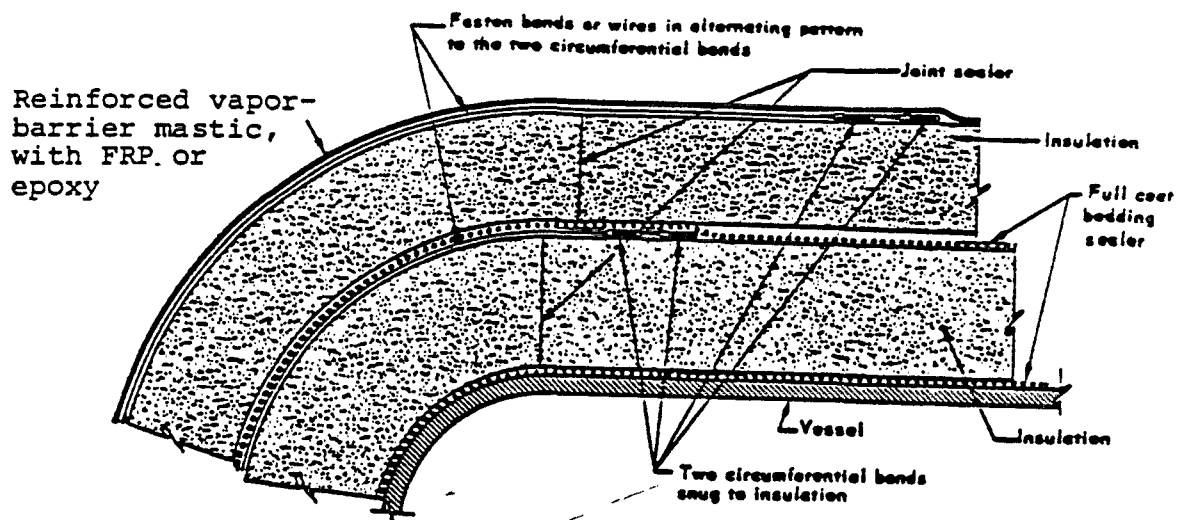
HORIZONTAL CYLINDRICAL EQUIPMENT - DOUBLE LAYER
